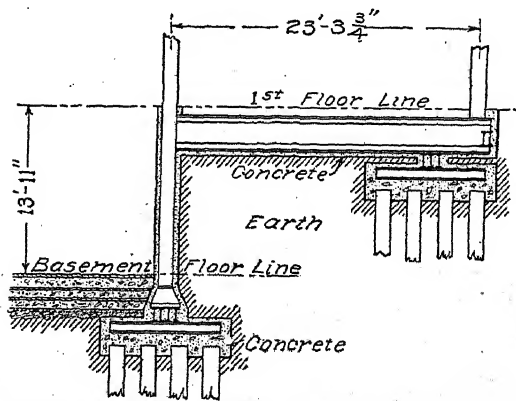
Timber Piles, Concrete Capping, and I-Beam Grillage.
